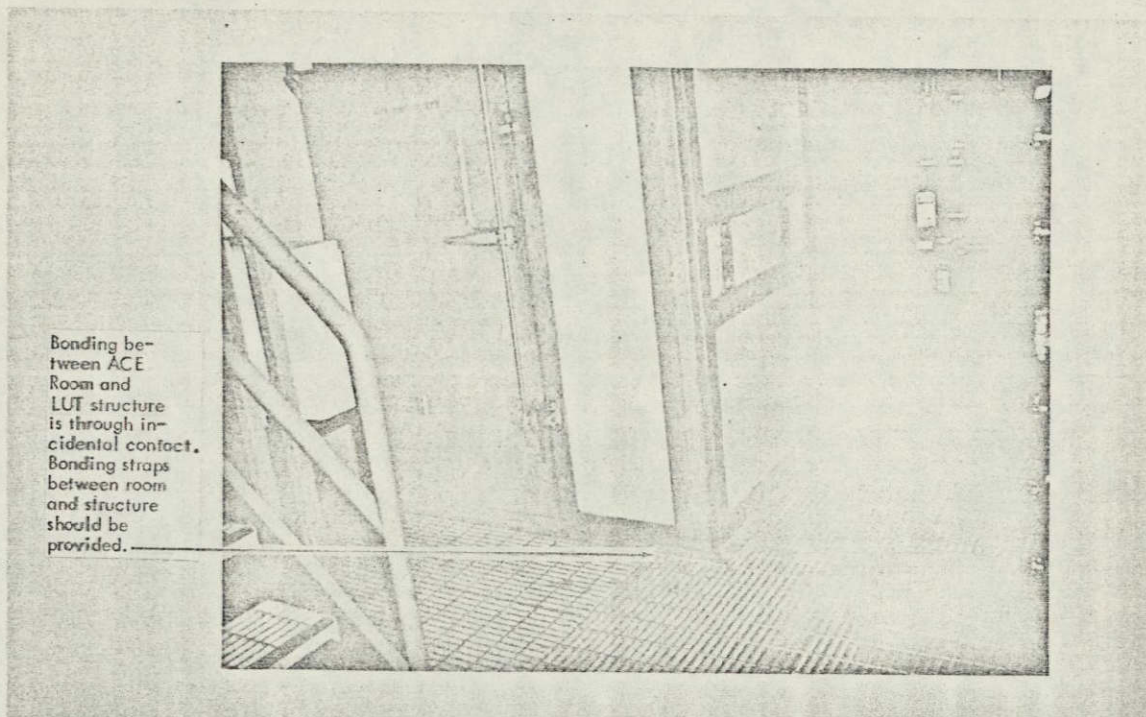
LUT-2, ACE Room, 280-Foot Level. Note lack of bonding to structure. Impedance as high as 70 ohms has been measured.
